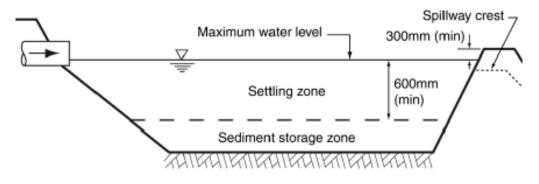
Typical type D sediment basin cross-section (Source: IECA, 2008)
